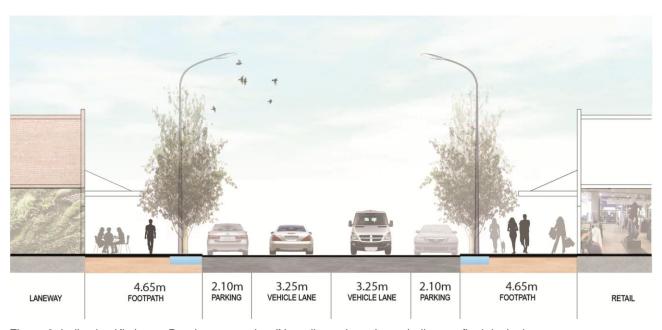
Indicative Kitchener Road cross section (Note dimensions do not indicate a final design).
